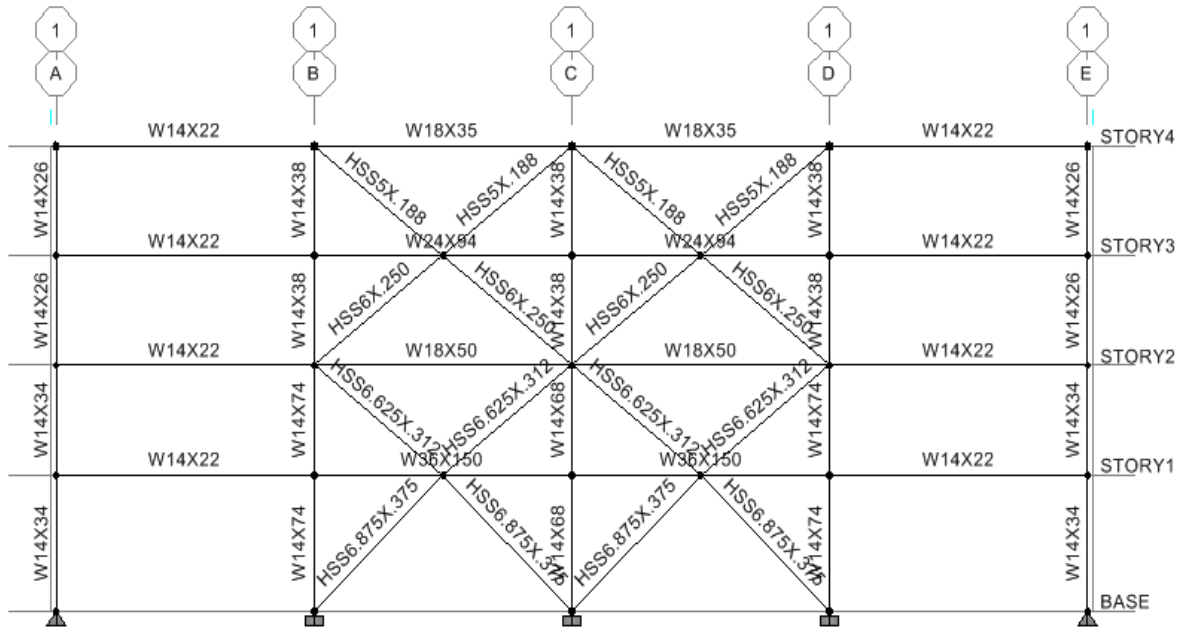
Elevation of Typical AISC 2010 Braced Frame
